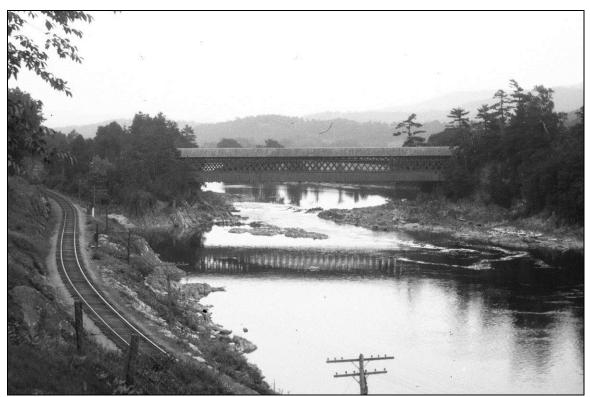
Stevens Village Bridge, built 1875, replaced 1937. Downstream side from Vermont, June 23, 1921 (Storrs).
